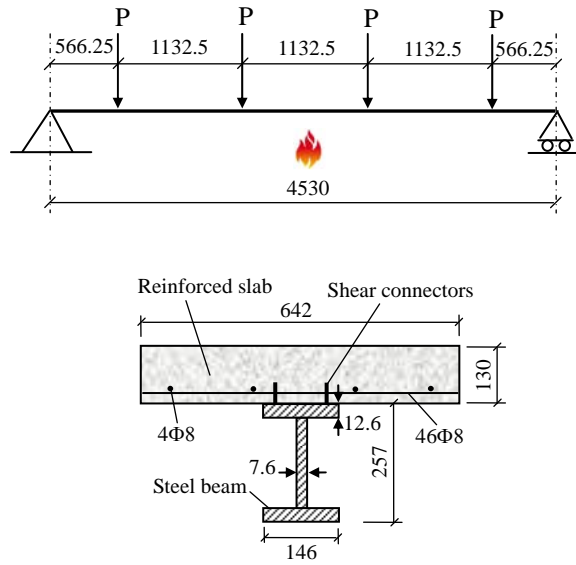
Schematic of tested composite beam (Test 15 and Test 16) (all dimensions in mm)
